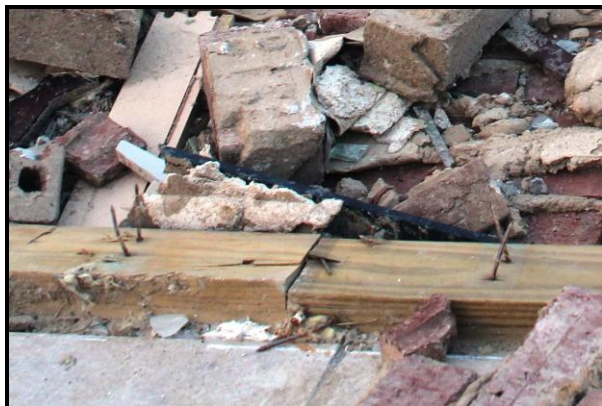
Closer view of the wall bottom plate at the office building. Straight-nailed connections between the wall studs and the bottom plates had pulled apart, as they had little resistance to lateral or uplift wind forces.
